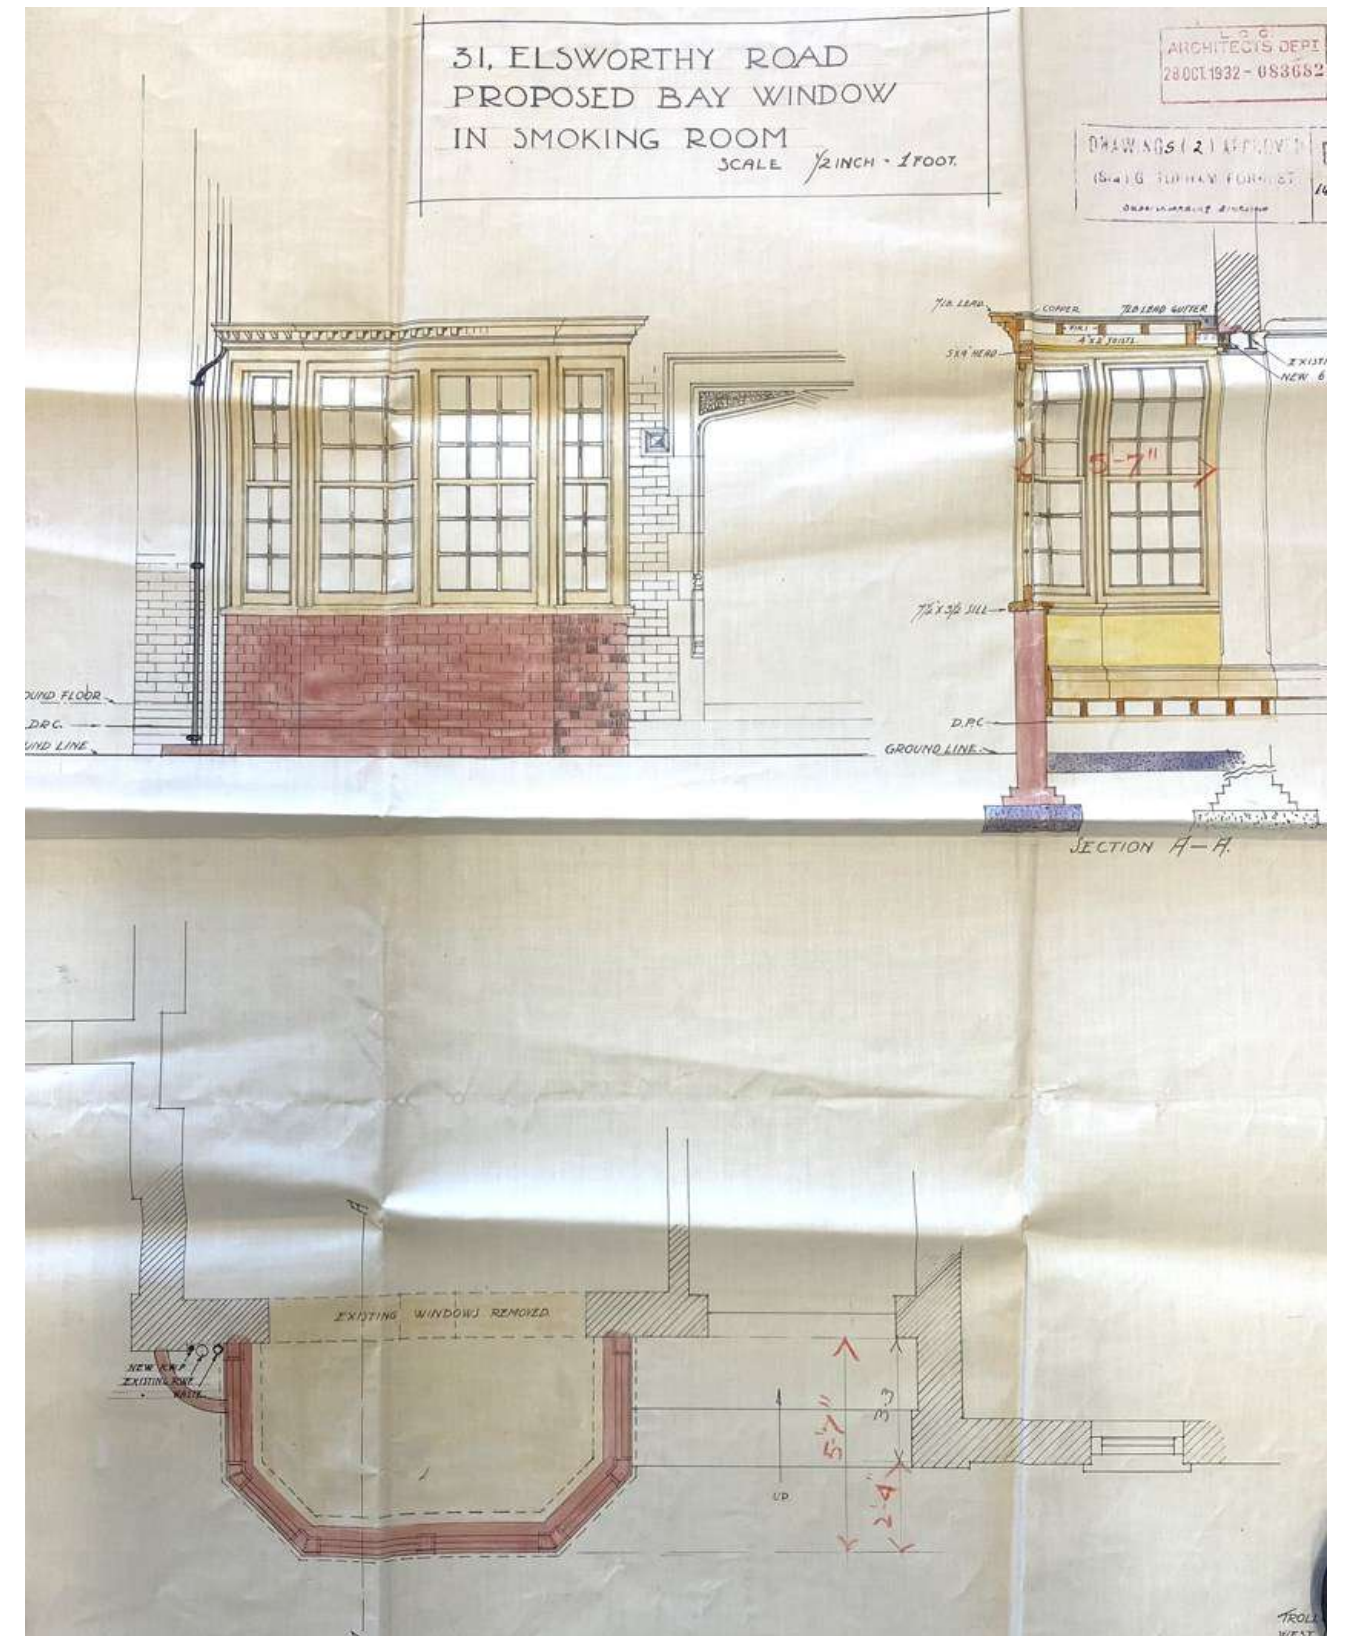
Proposal drawing showing the proposed ground floor bay window, 1932.
